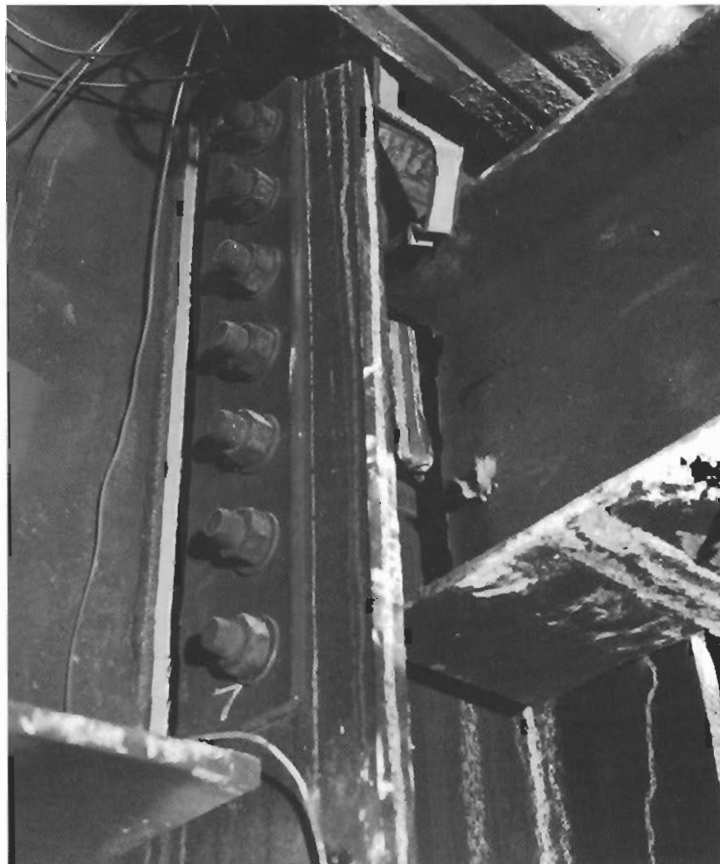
Structural behaviour towards the end of the test (notice the local buckling on the second internal secondary beam)
